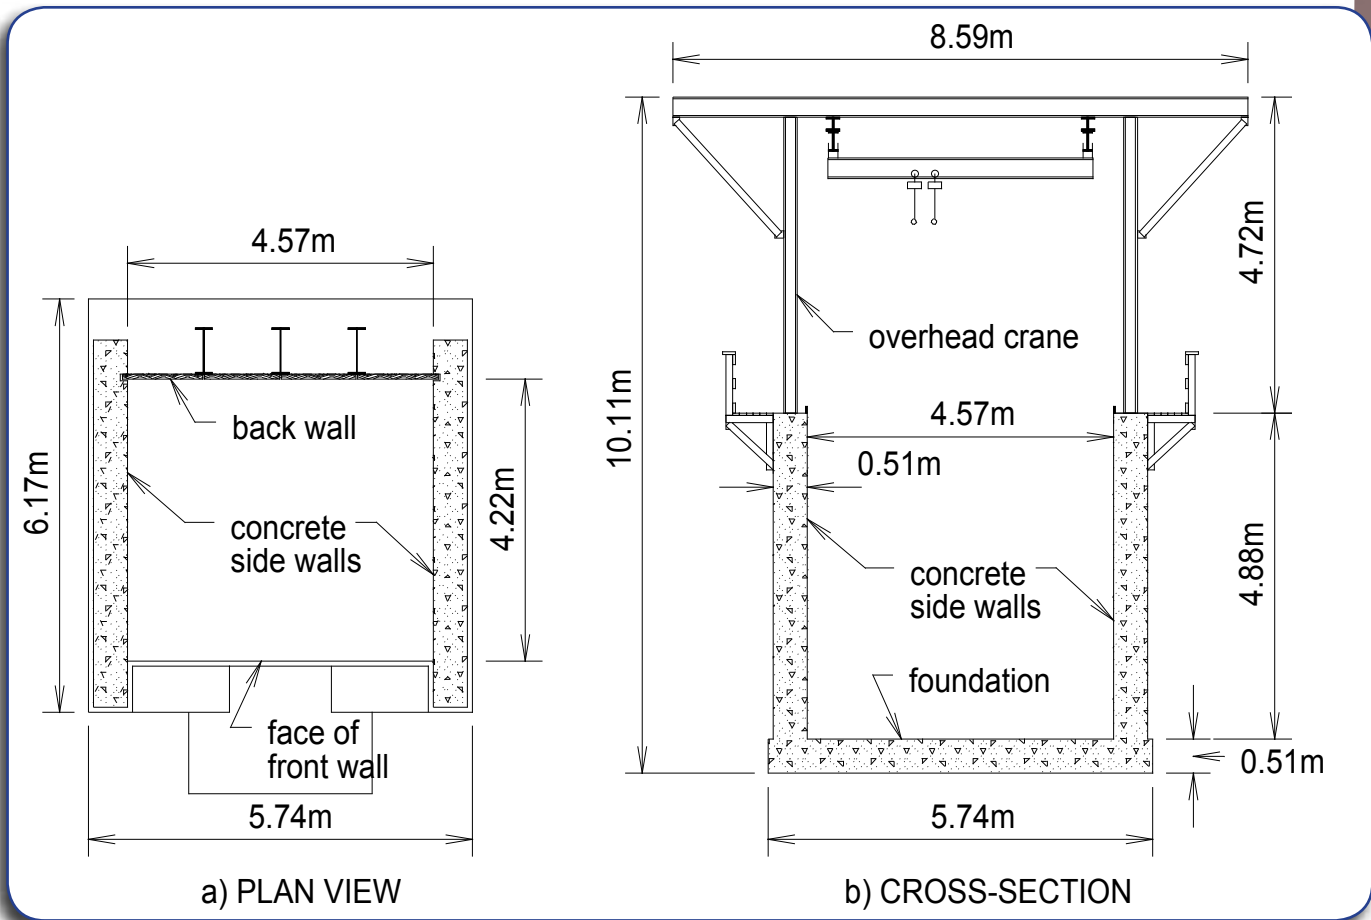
Plan and cross-section of full-scale retaining wall test facility
